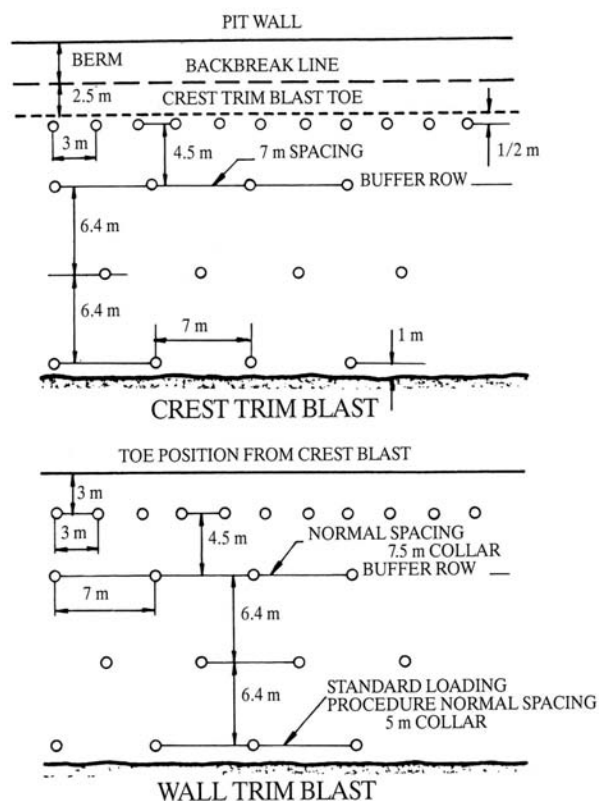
Two trim blasts designed to run two benches into a final face between berms.
